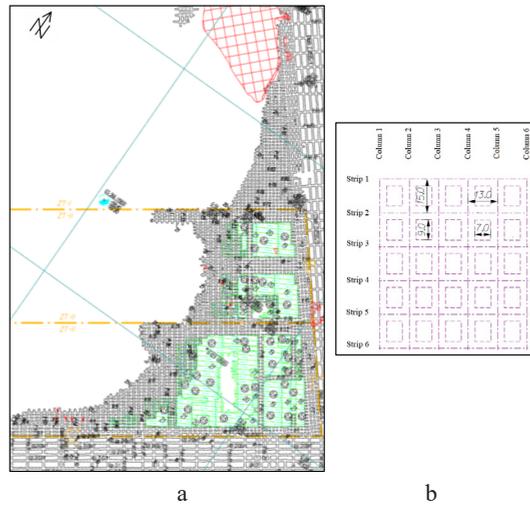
The room and pillar system at the SI-XII mining field: a) Outline of the room and pillar system with the roof layers deflection; b) Dimension of rooms and pillars
